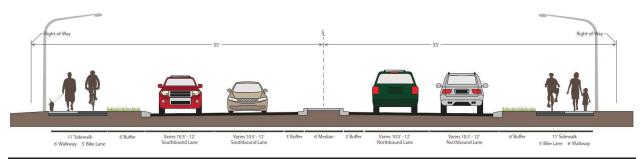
Proposed Typical Section –NE McWilliams Road to NE Fairgrounds Road
